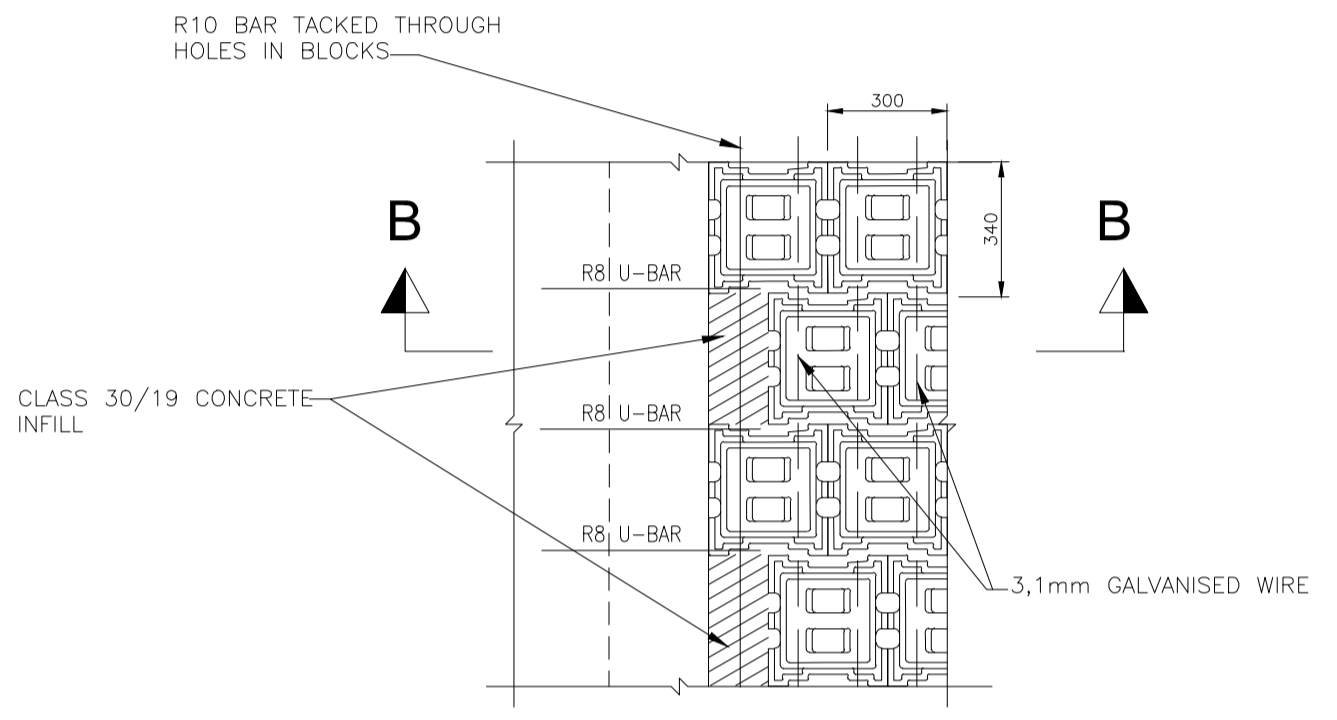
FOR ANCHORING ALONG TOP EDGE OF ARMORFLEX LINING: Y-FENCING STANDARDS
